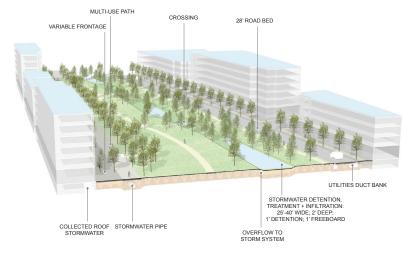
Long-Term Greenway Illustrative Plan and Cross Section (2013 IMP)
